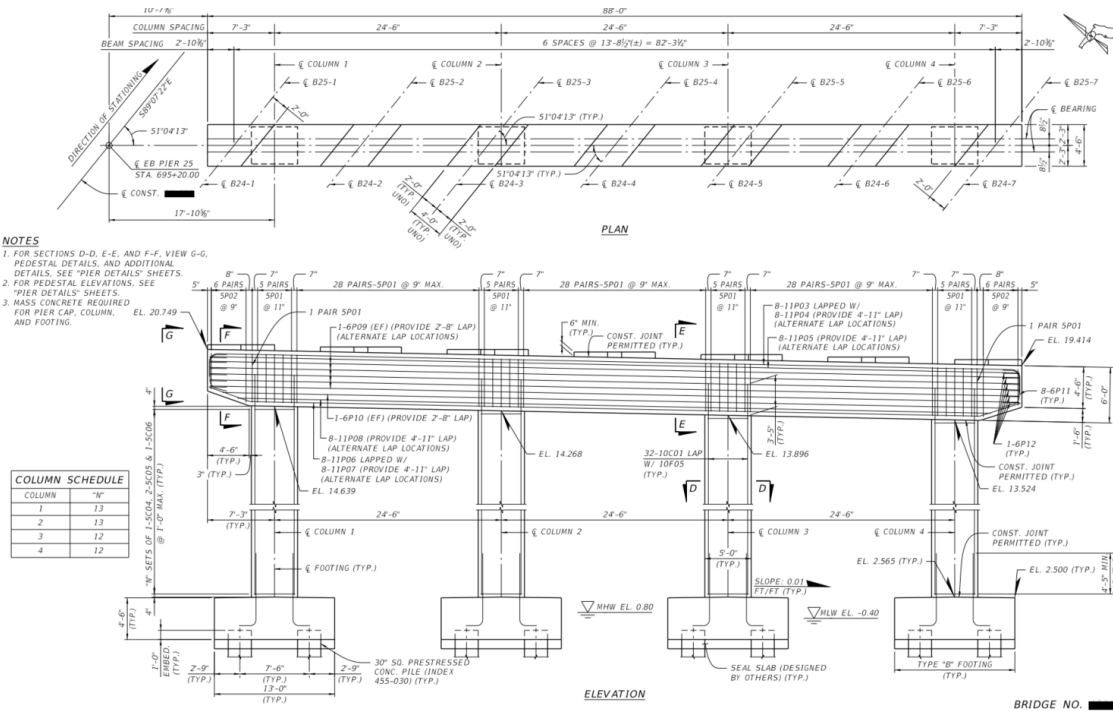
Carbon-steel reinforcement layout – Pier cap of the selected Pier n.25 of the Eastbound Bridge (B1-112)
